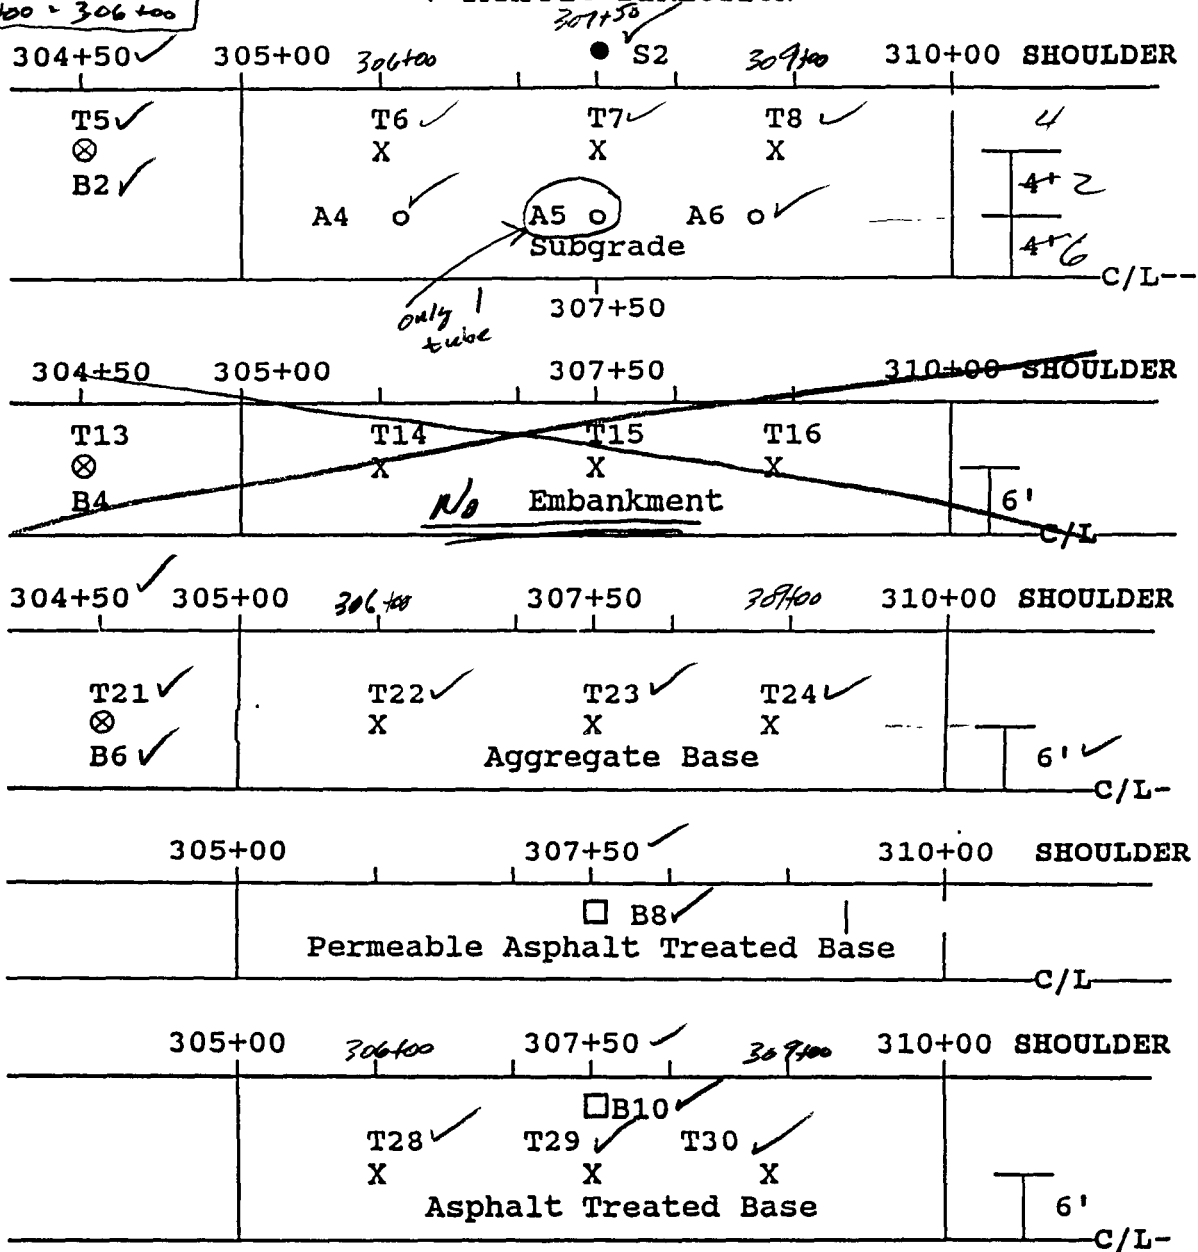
A SAMPLING AND TESTING FOR Section 390903
